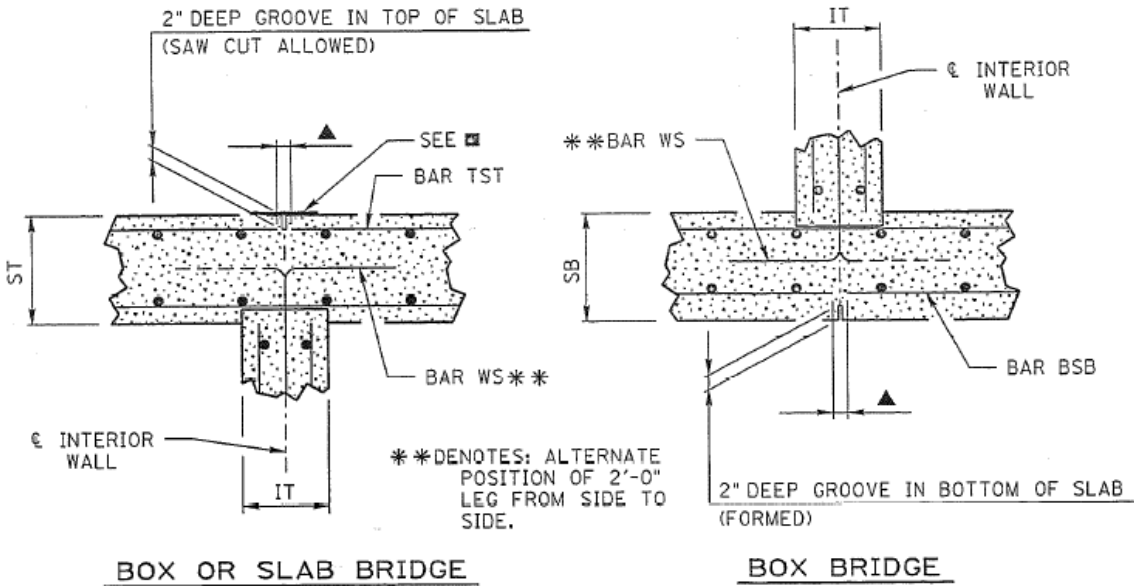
TDOT Construction Joints between Slabs and Interior Walls (TDOT 2000c)
